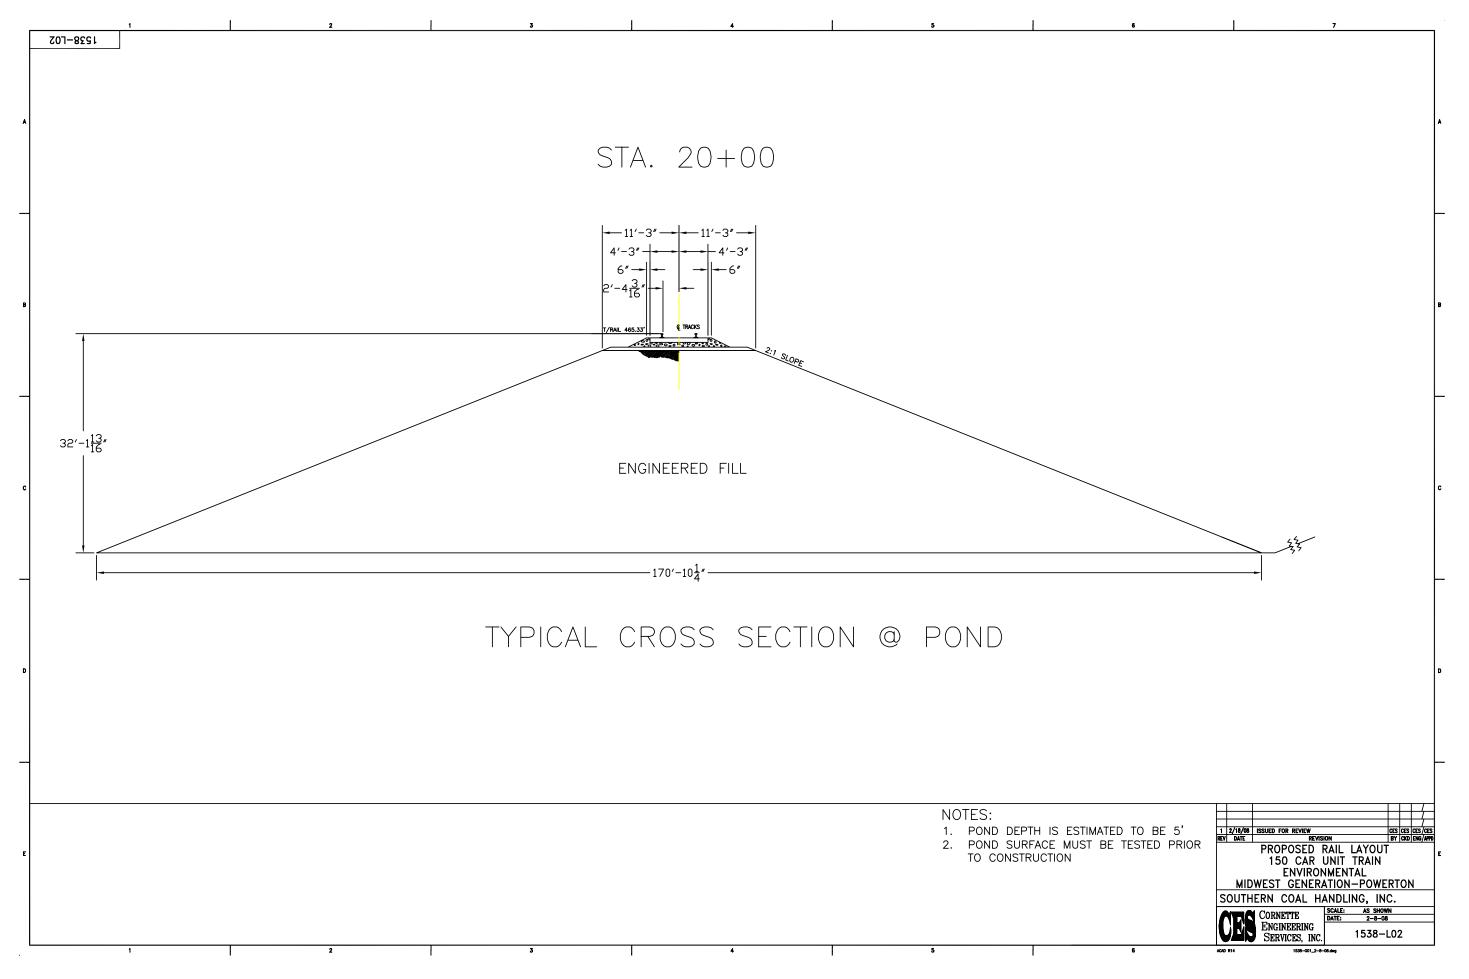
RAIL LAYOUT CROSS SECTION
